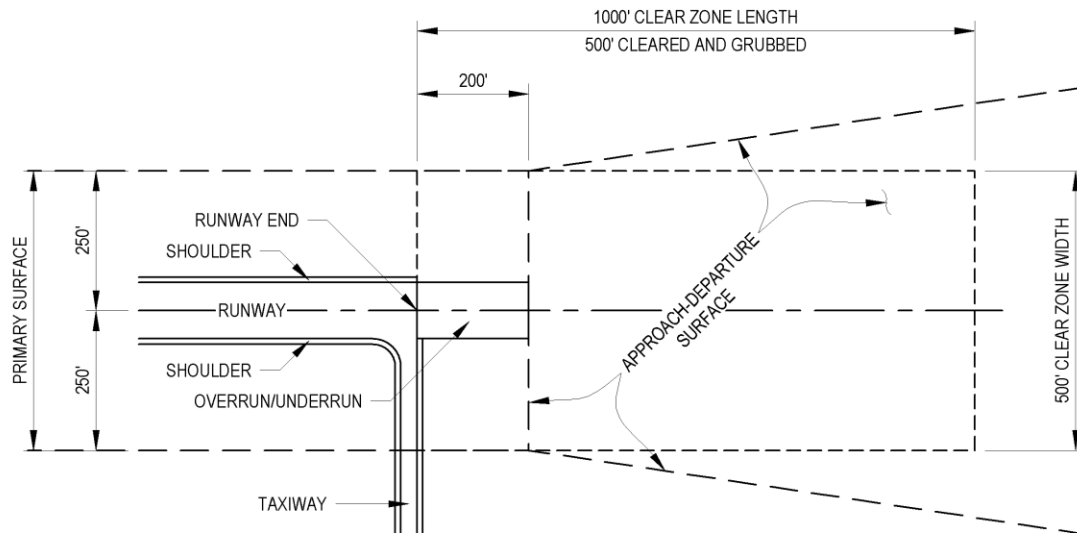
RQ-7Bv2 Shadow Primary Surface End Details
